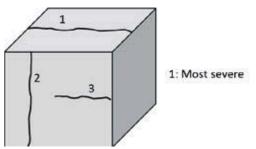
Illustration of the observed long-term influence of concrete surface and crack orientation on ingress in cracks.
